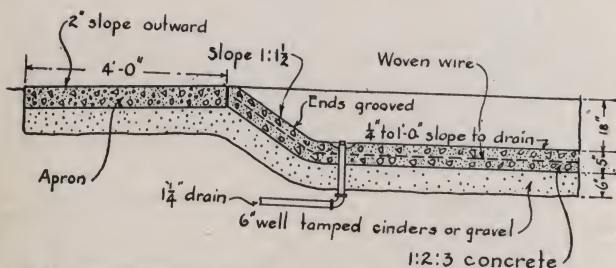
Partial Sectional View of a Concrete Hog Wallow. The Wallow is Simply a Big Concrete Bowl With a Floor Four Feet Wide Around the Edge
